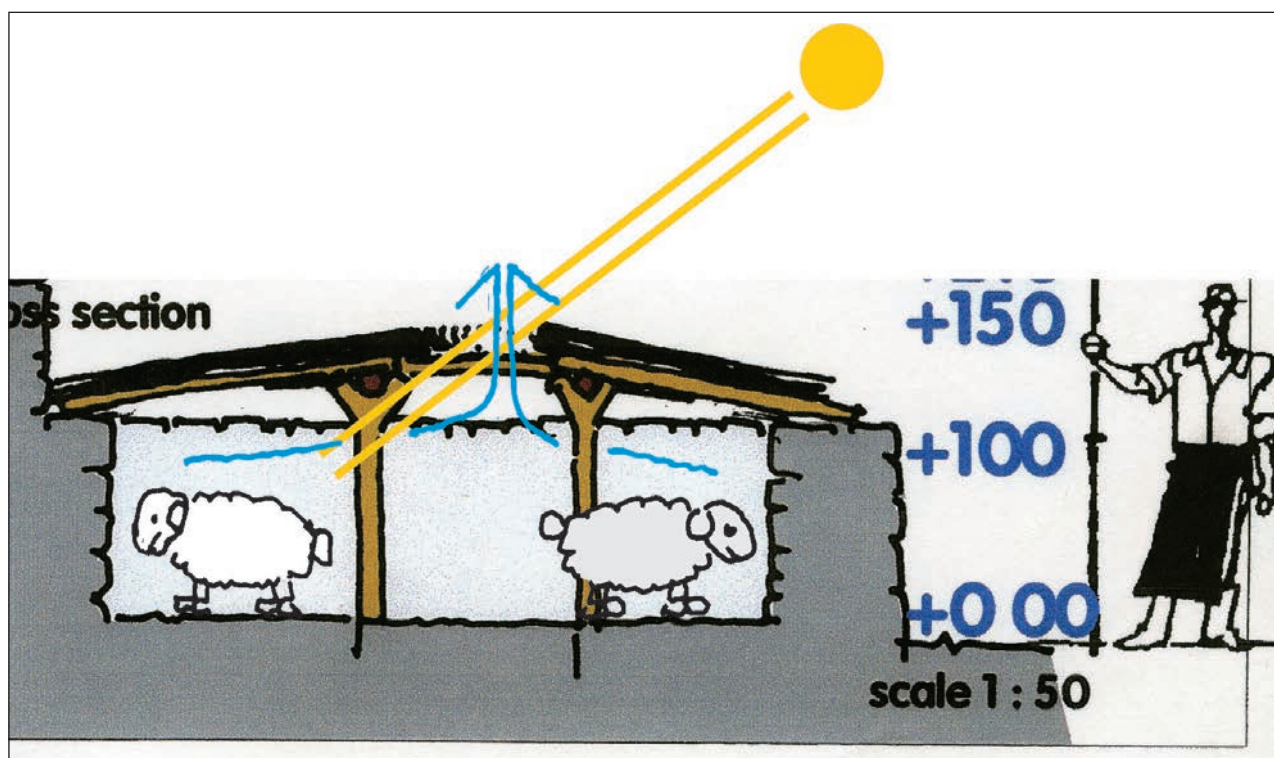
'Mošuna', the cross section shows the construction and its use – sheep need shade, limited sunbeams and more or less cold air. The slopes of the roof lead warm air upwards until the missing ridge, where it exits (Source: B. Juvanec).
